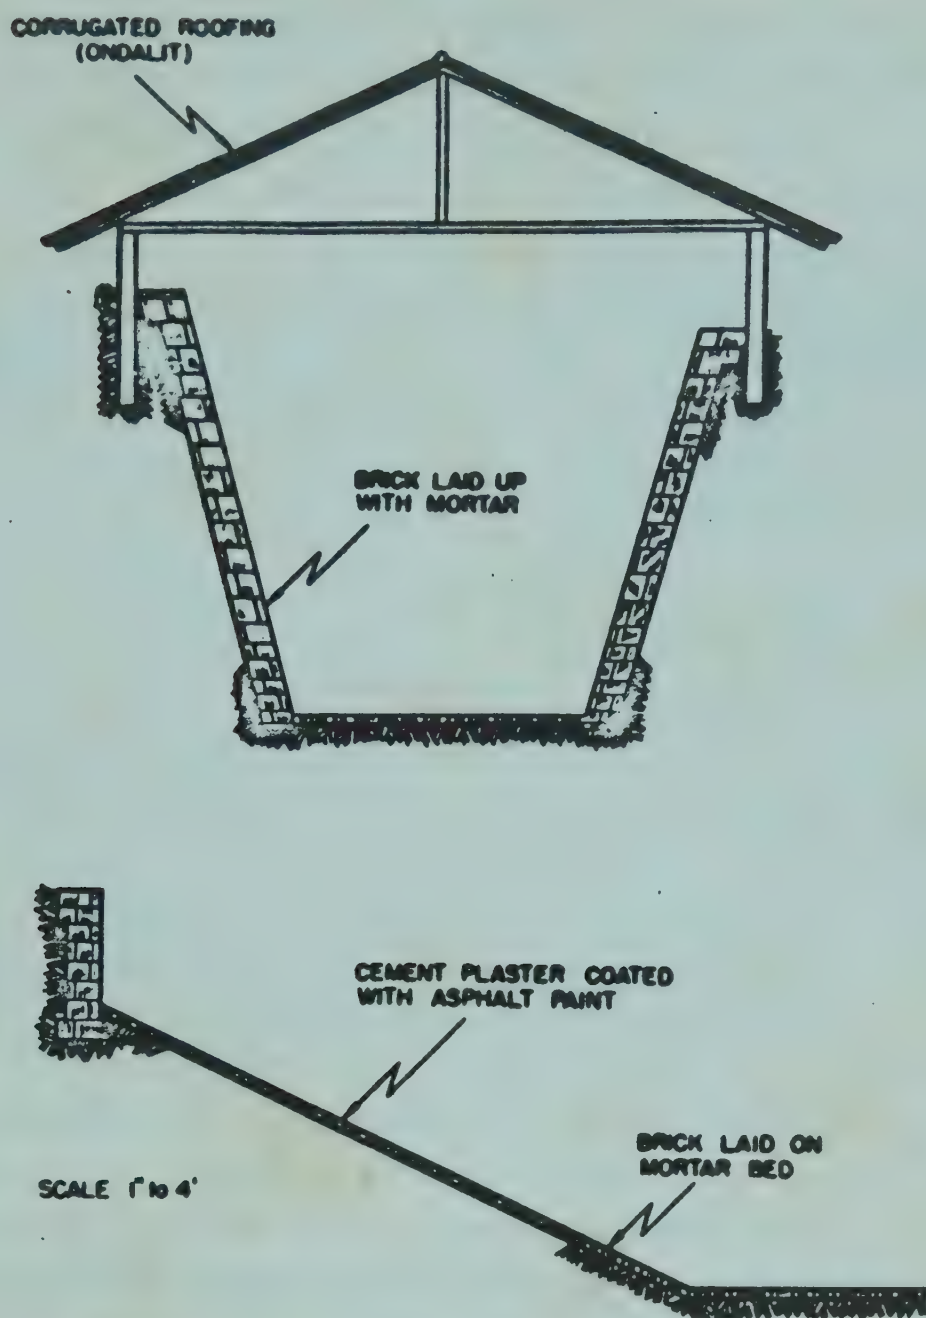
Cross and longitudinal sections of a 400 metric ton silo showing its construction features. The surface of the grain when the silo is filled conforms to the slope of the end walls to drain off any water which may collect there (Gattoni, 12).
